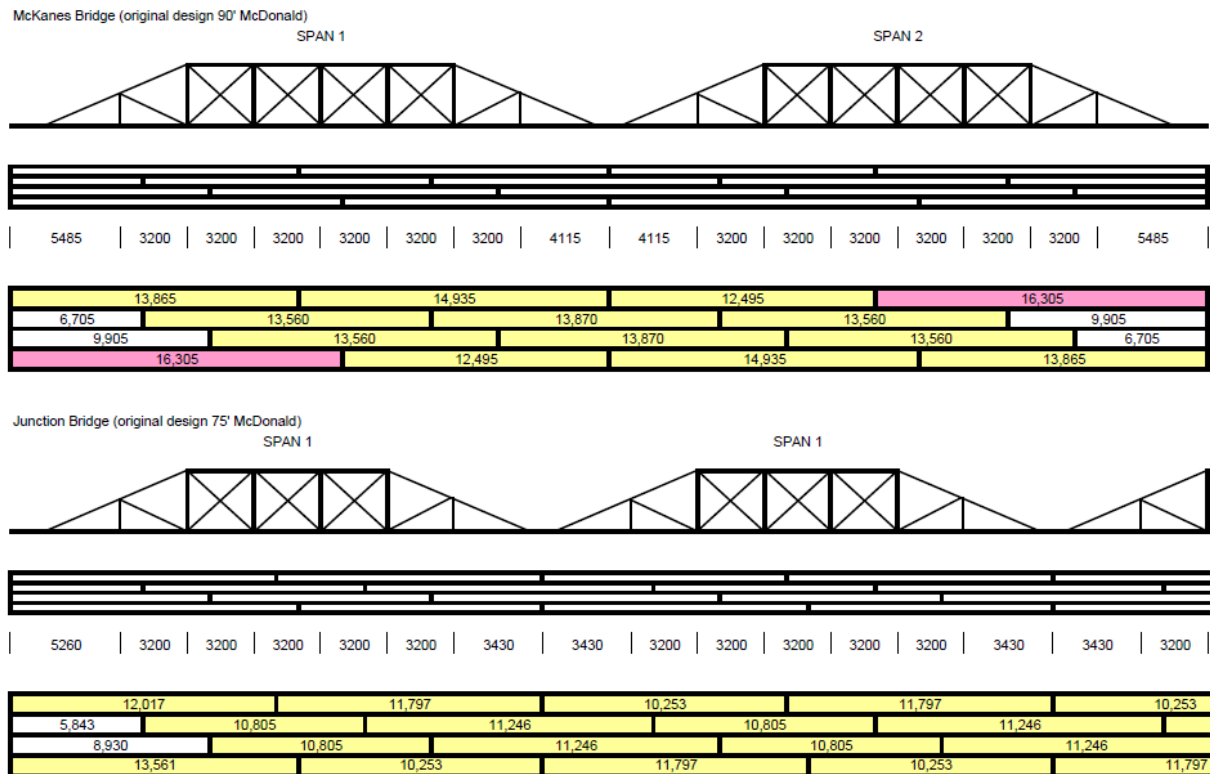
Layout of Laminated Timber Bottom Chord in McDonald Trusses
